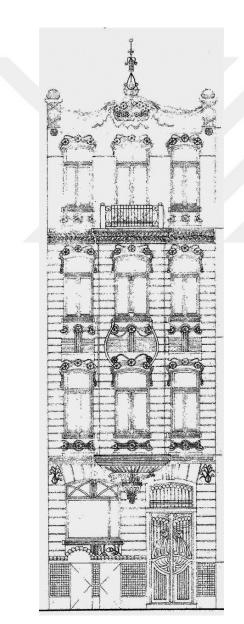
Old exterior facade drawing of Changa Restaurant
